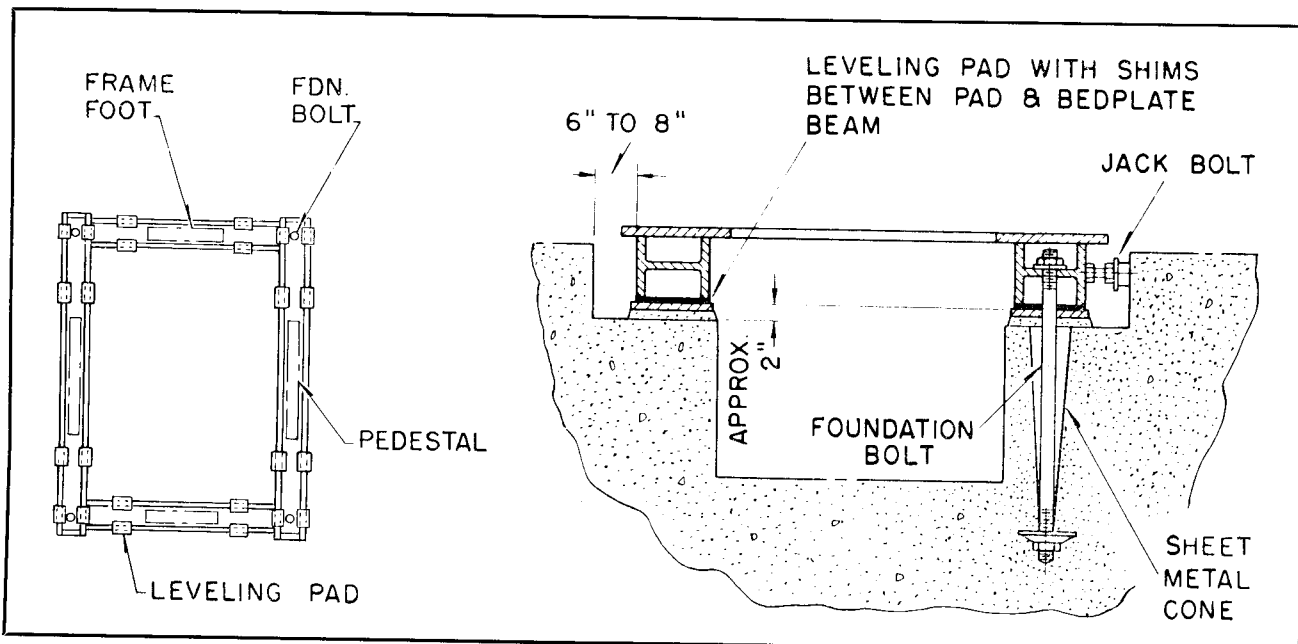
Method of Anchoring Foundation Bolts and Typical Arrangements of Bedplates, Leveling Plates and Shims
